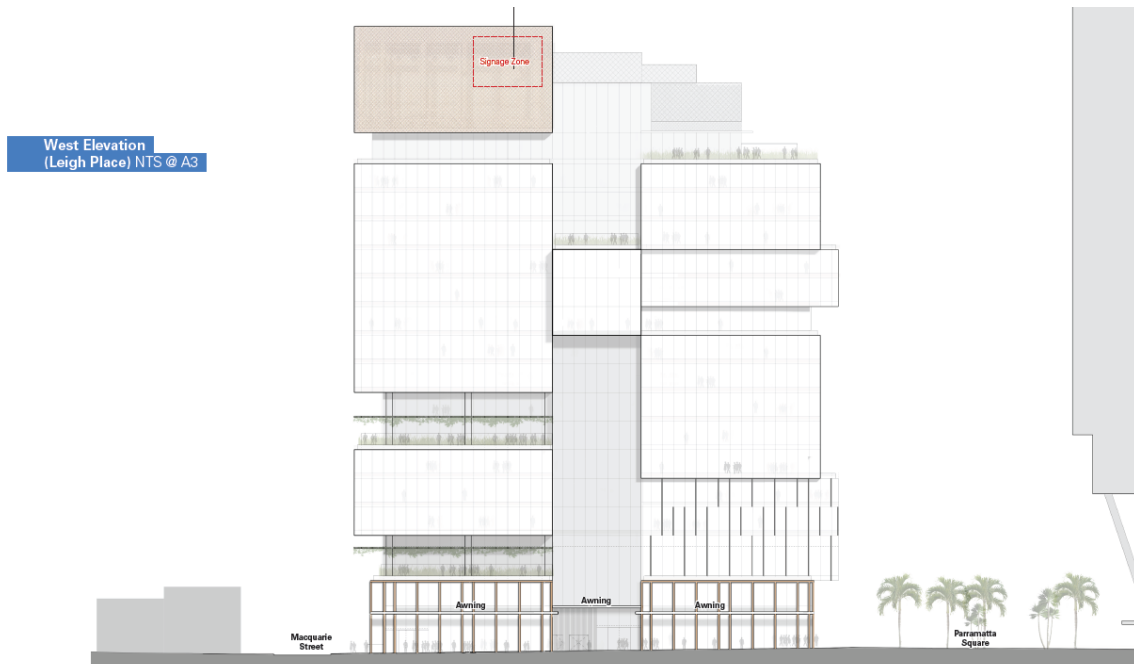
Leigh Place Elevation (Source: JPW, May 2017)
